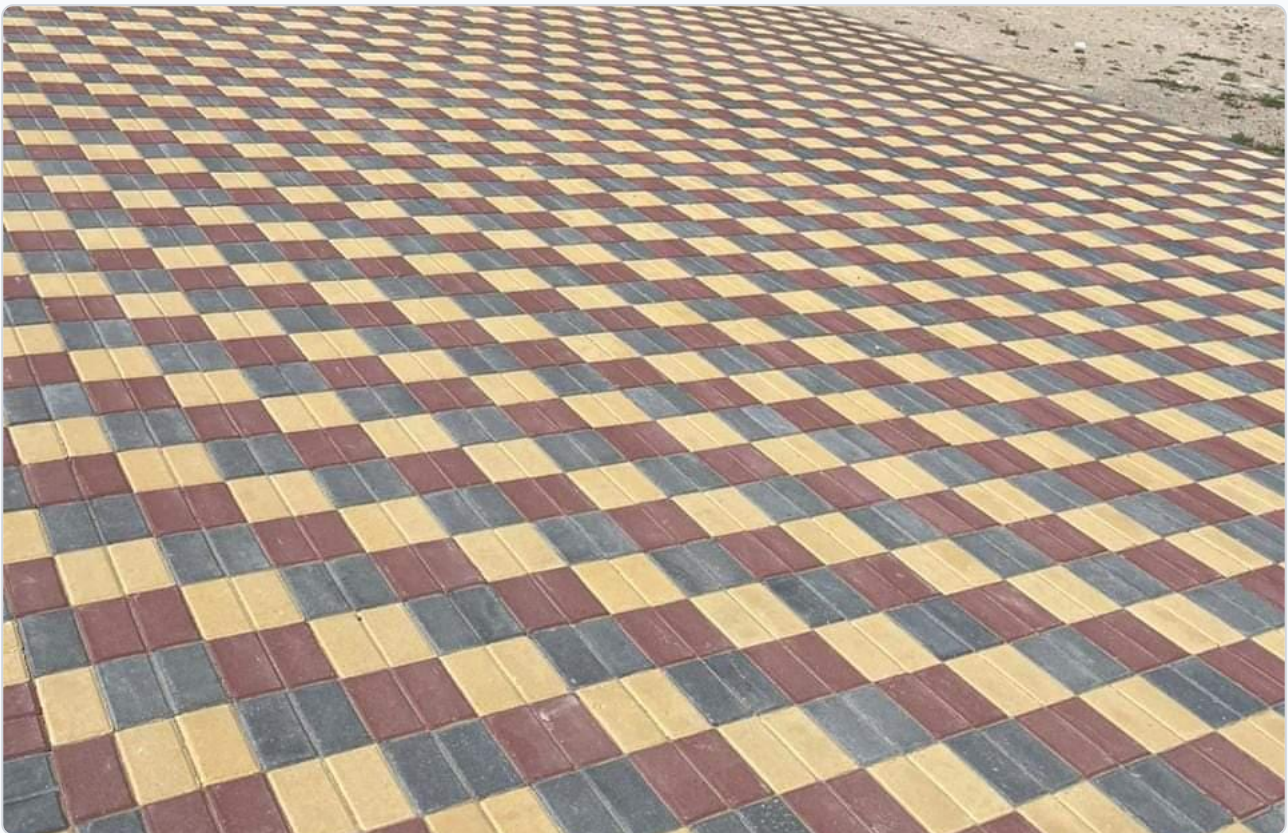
High-load, multi-colored interlocking pavement layouts executed across an external infrastructure zone.
